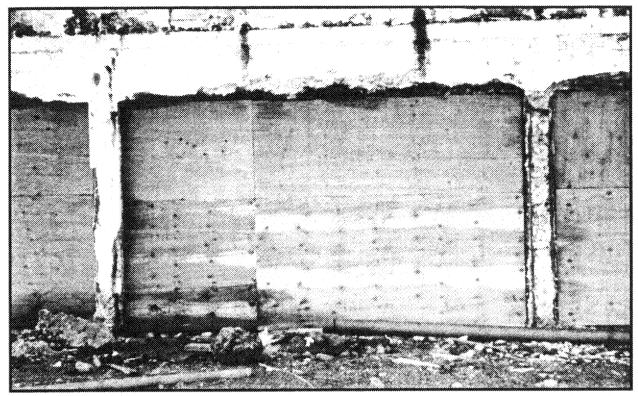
Spalled concrete and rusting reinforcement rod show at the northwest corner of the building (here looking south), beneath the blubber house. The openings were boarded up with plywood in 1992.
